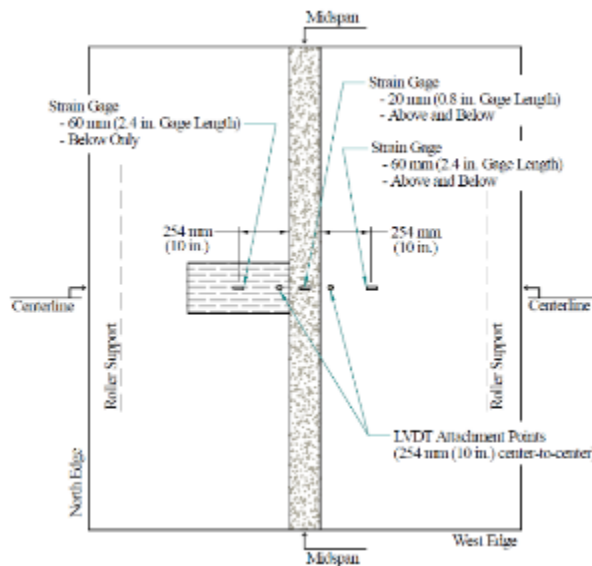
Layout for longitudinal joint specimen (Graybeal 2010)
